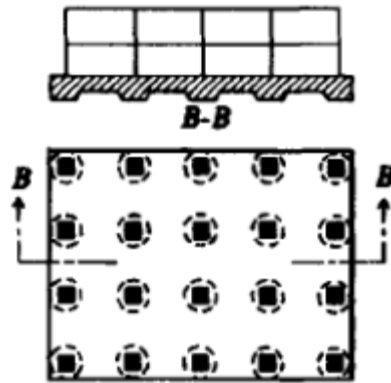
Plate thickened under columns. (Bowels, 1996)
